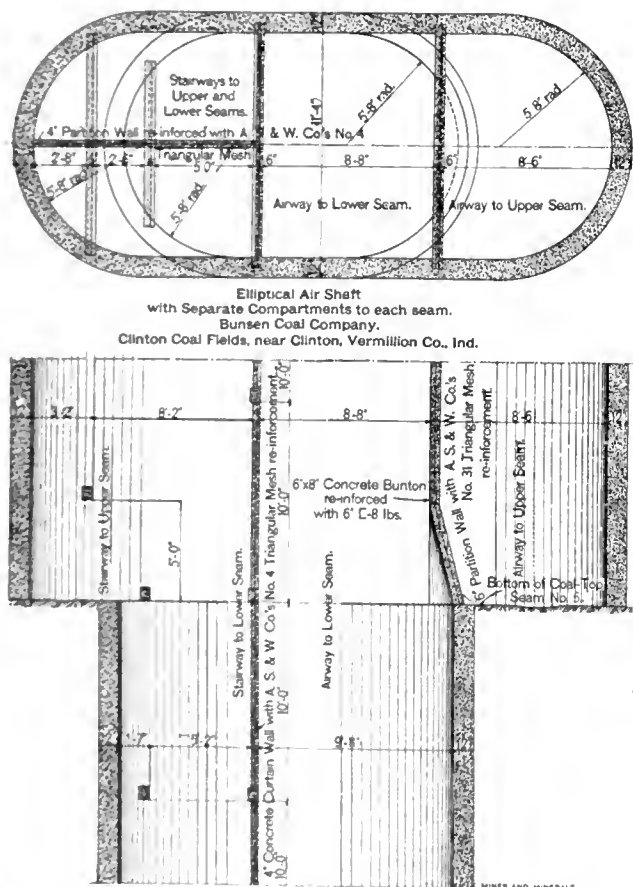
ELLIPTICAL CONCRETE AIR-SHAFT, WITH TWO COMPARTMENTS, STEEL CHANNEL BUNTONS, AND WIRE MESH REINFORCEMENT
